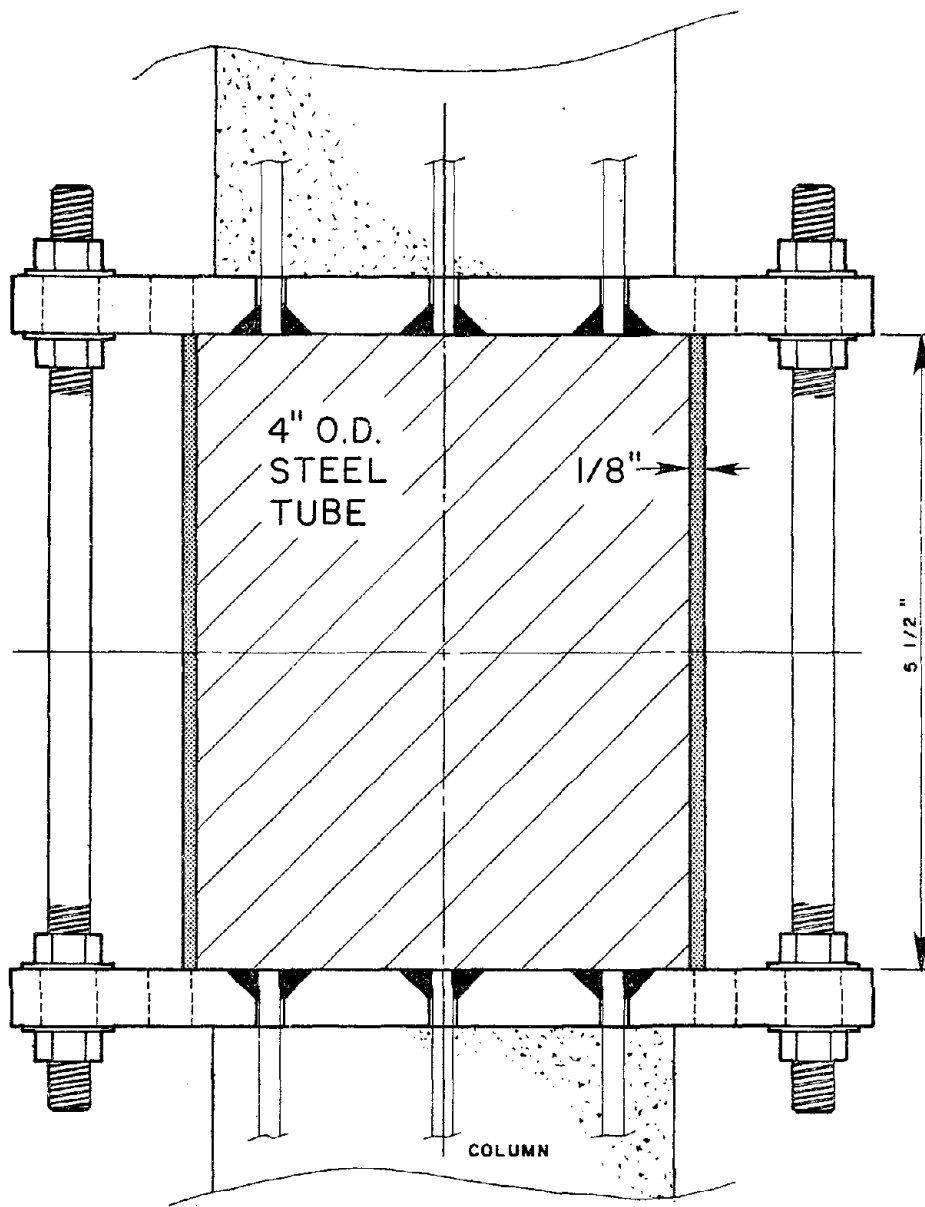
LONGITUDINAL COLUMN SECTION SHOWING STEEL TUBE IN I.F.T. LOCATION DURING CONSTRUCTION.
